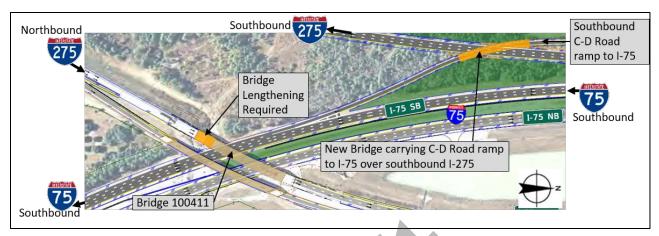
Alternative 2–C-D Road Ramp Bridge over I-275 & Northbound I-275 Bridge
